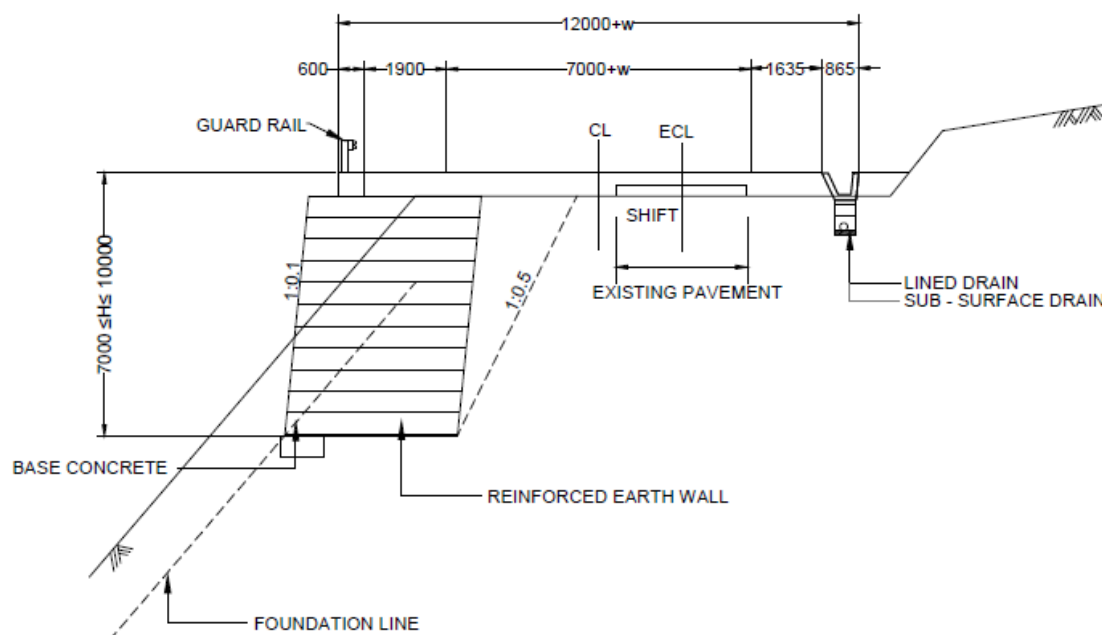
(6): Typical Cross Section – Type 6 (Mountainous and Steep Terrain)
